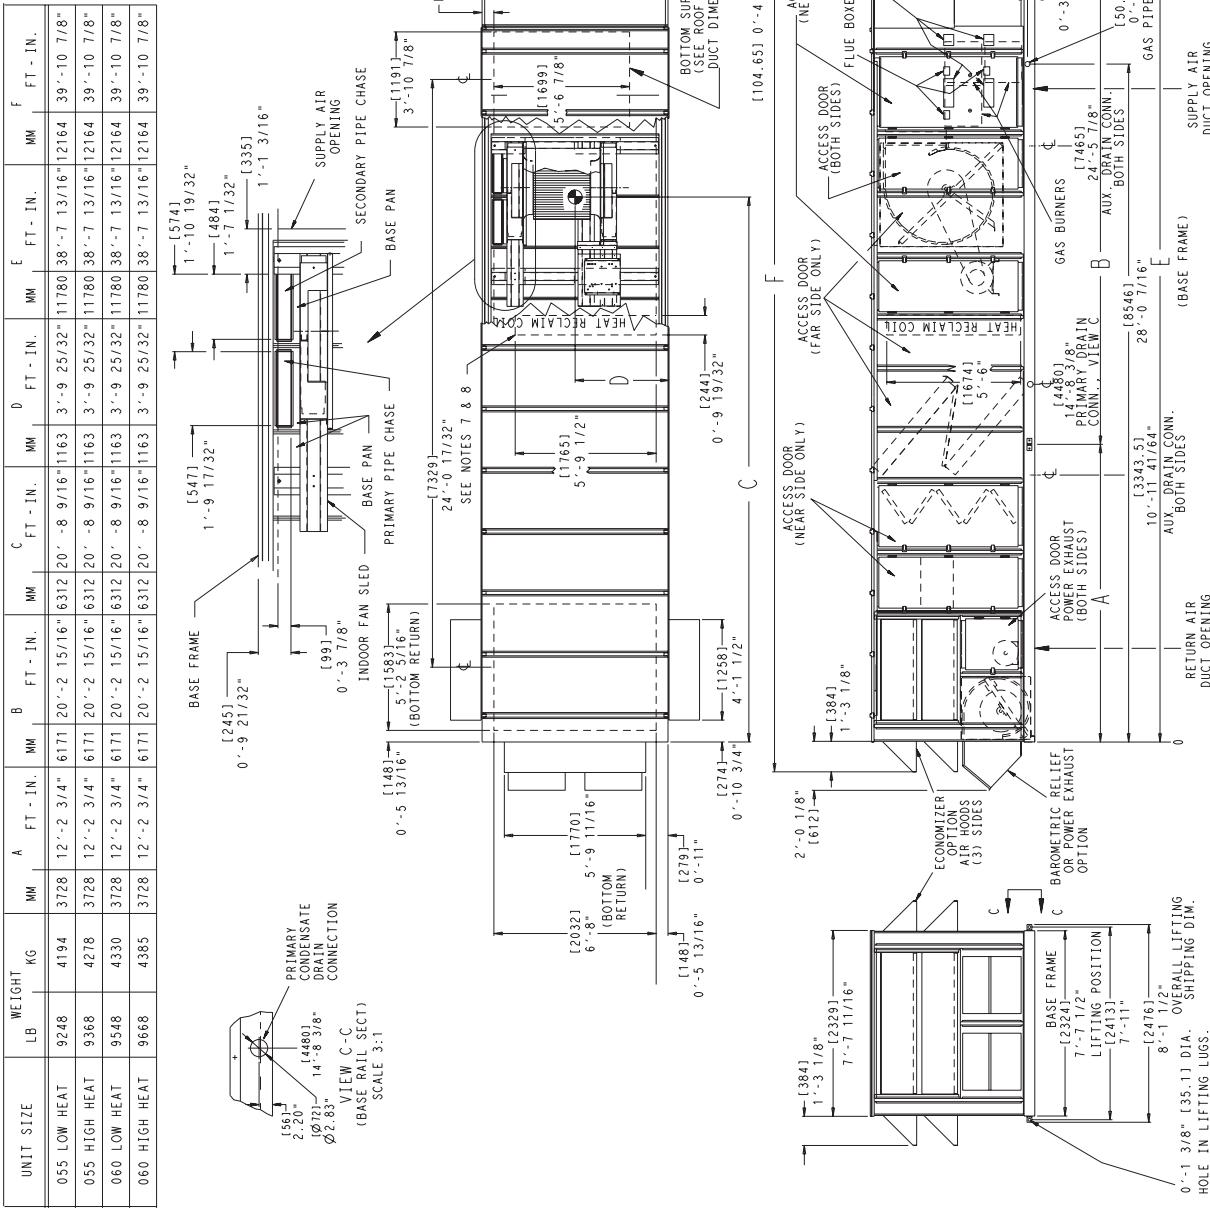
Base Unit Dimensional Drawing — 48ZG-ZN055,060 (Extended Chassis)
